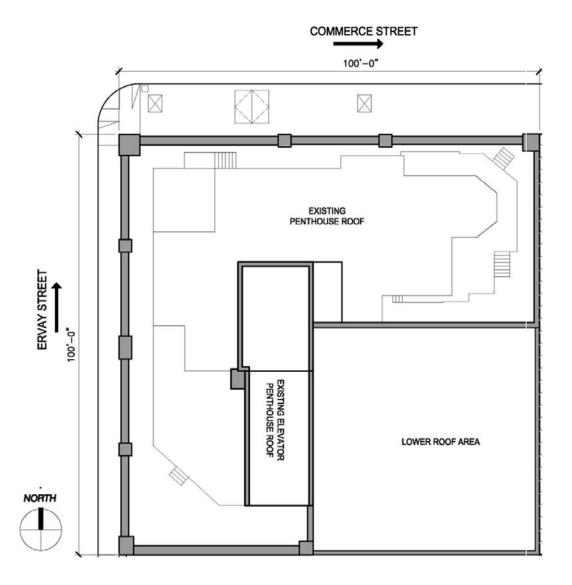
Site Plan showing upper roof with existing penthouse and lower roof (Merriman Associates, 2014).
